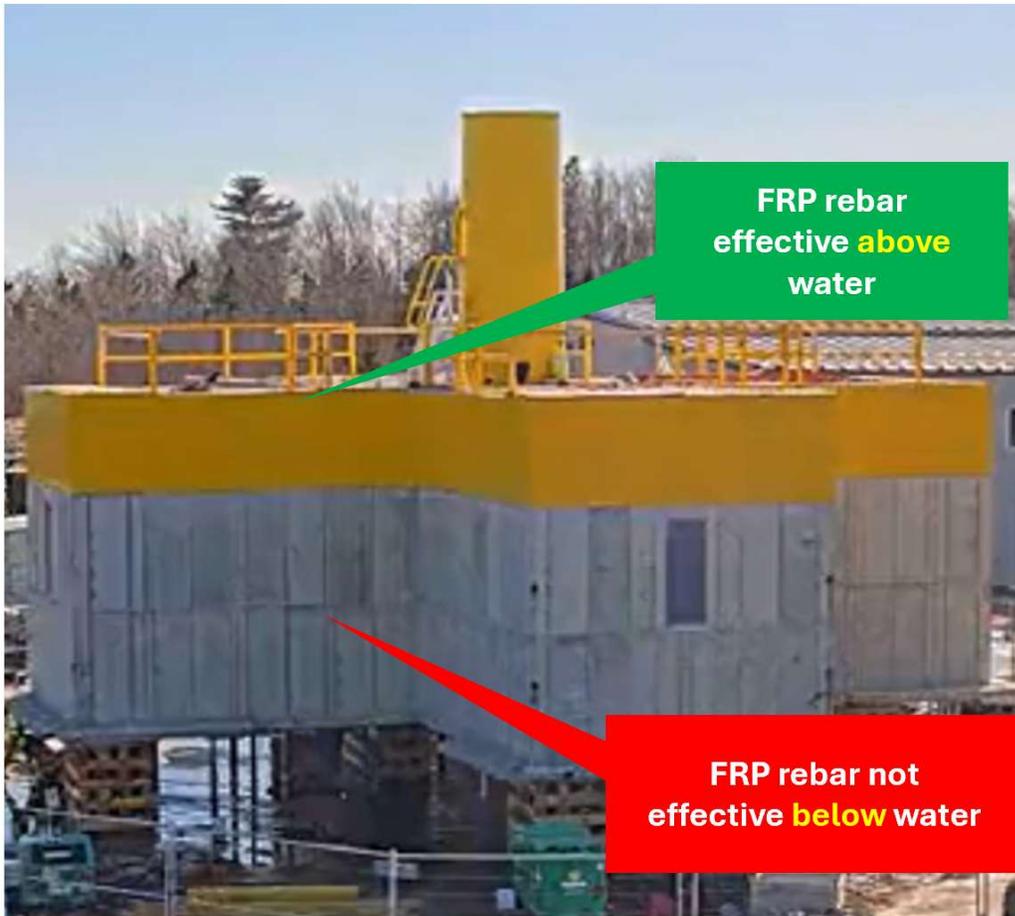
Preferred Reinforcing Types for Locations within the VoltturnUS Concrete Foundation
